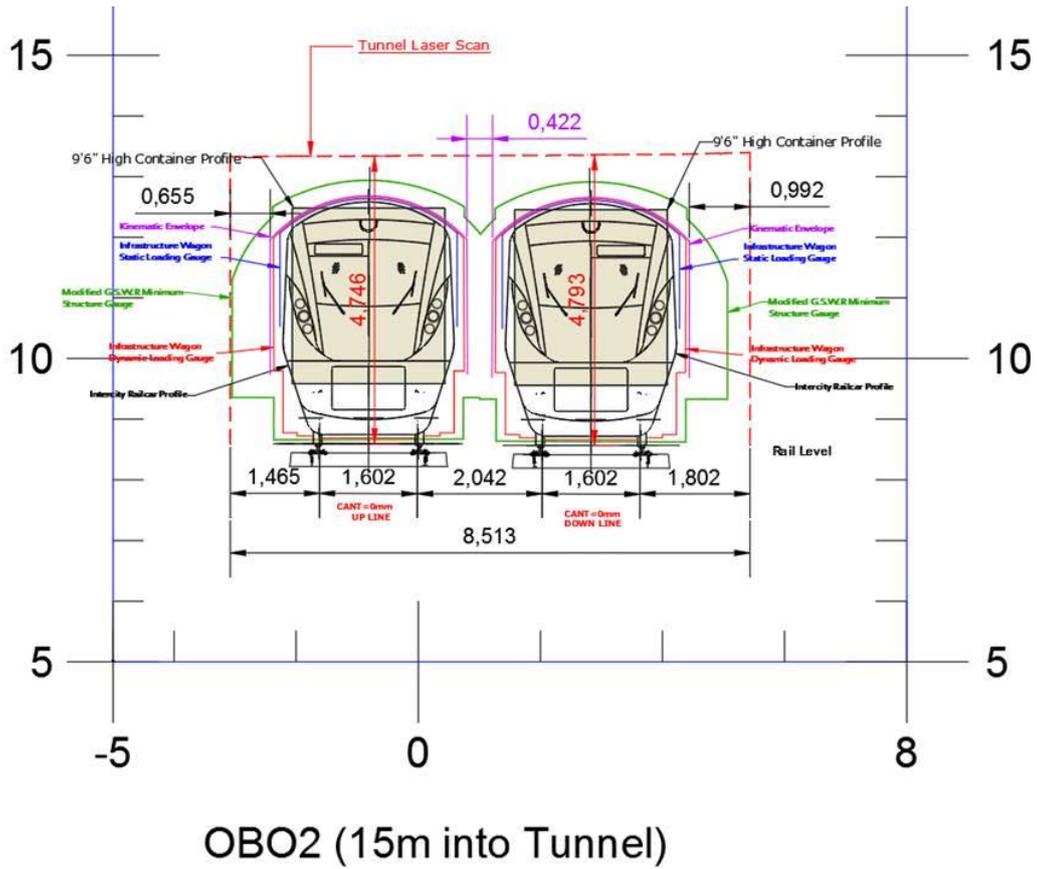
Track Cross Section under OB02 Conyngham Road Bridge at 15m into Tunnel
